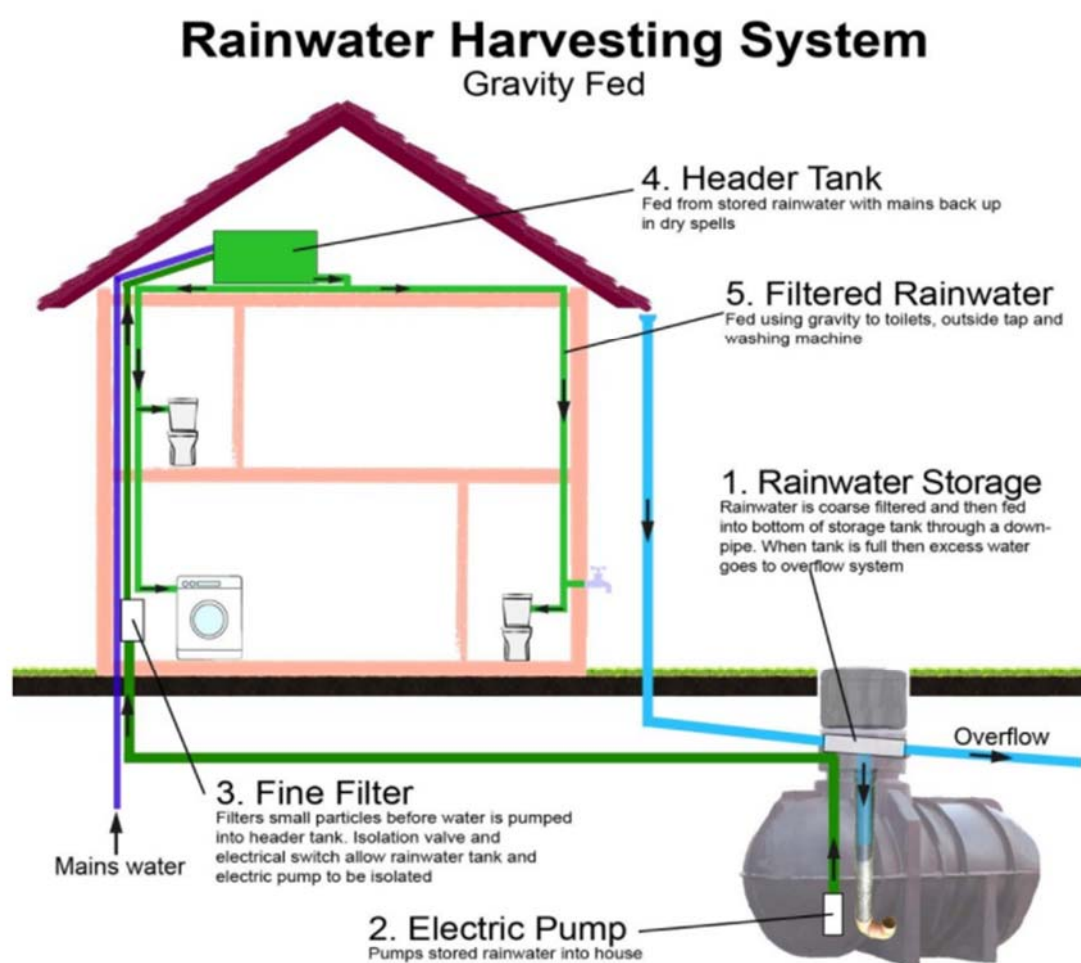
Typical arrangement of a domestic water re-use system⁵⁷
